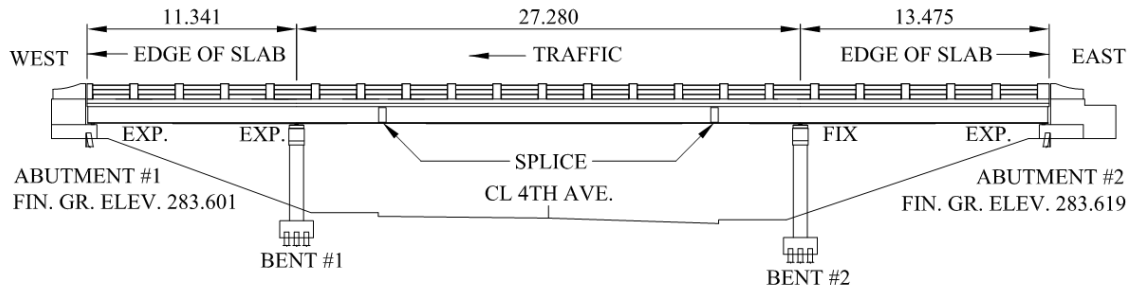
I-40 westbound over 4th Avenue: elevation (m)
